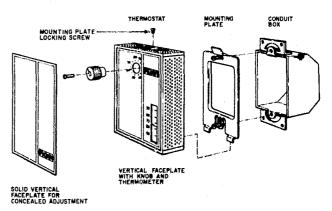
Line drawing illustrating method of mounting a vertical thermostat to outlet box. Also shown is a solid vertical faceplate for concealed adjustment when desired.
